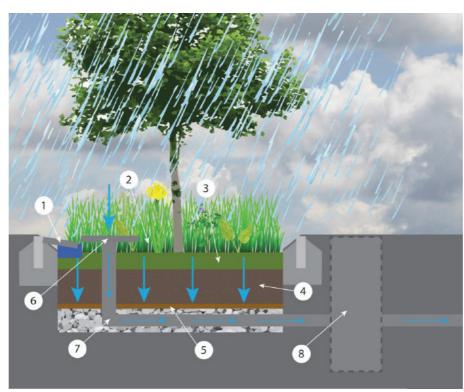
DMURS Gudiance Note 5 - Rain Garden Section
